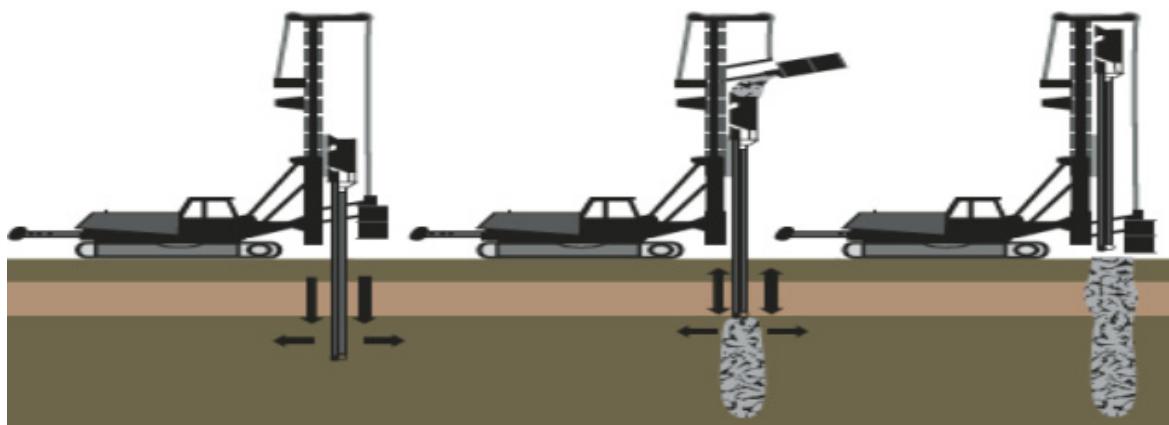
Stone column method for liquefaction reinforcement (New Zealand Geotechnical Society, 2021)
